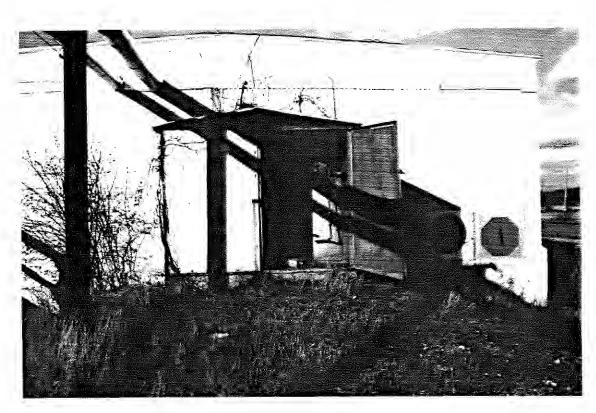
SEAD-66, 11/29/90. Close-up of possible Pesticide Storage Area near Building 5, facing north.
